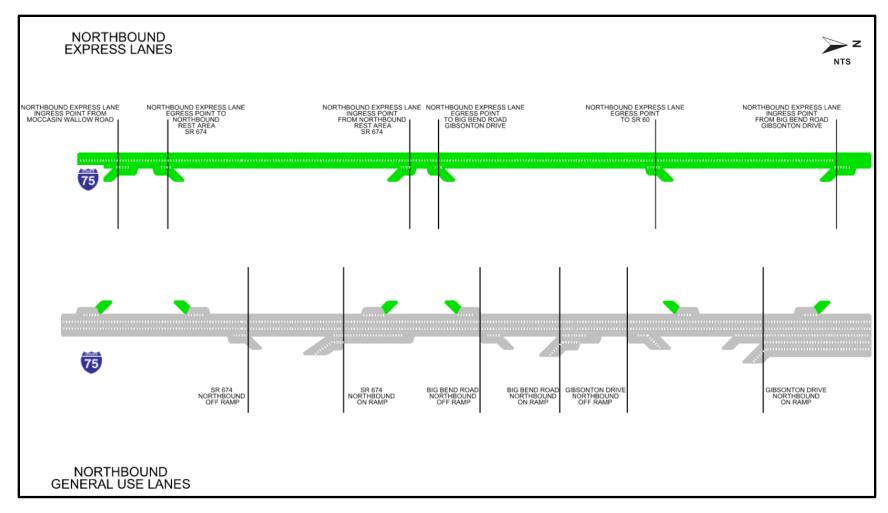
Build Alternative - Northbound I-75 Lane Geometry
